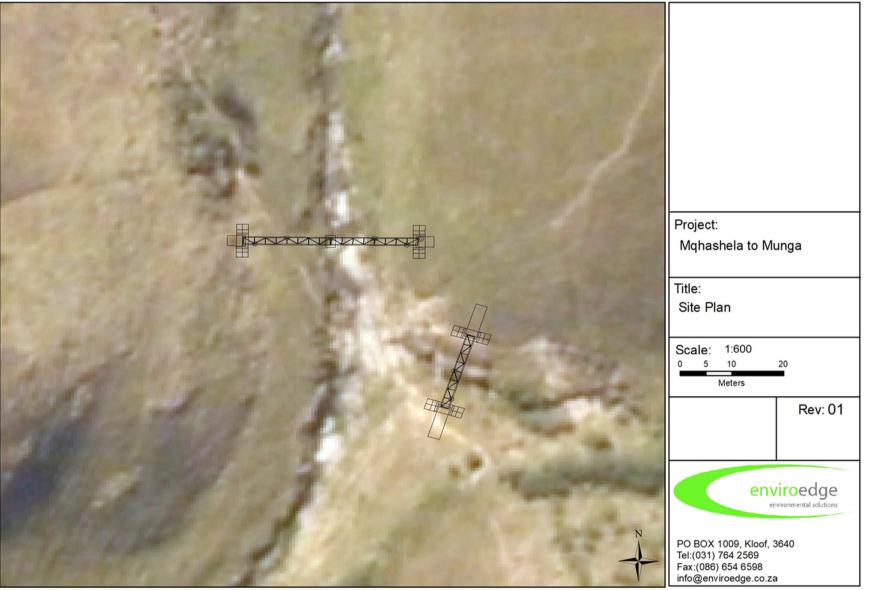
Mqhashela to Munga Pedestrian Bridges – Site Plan
